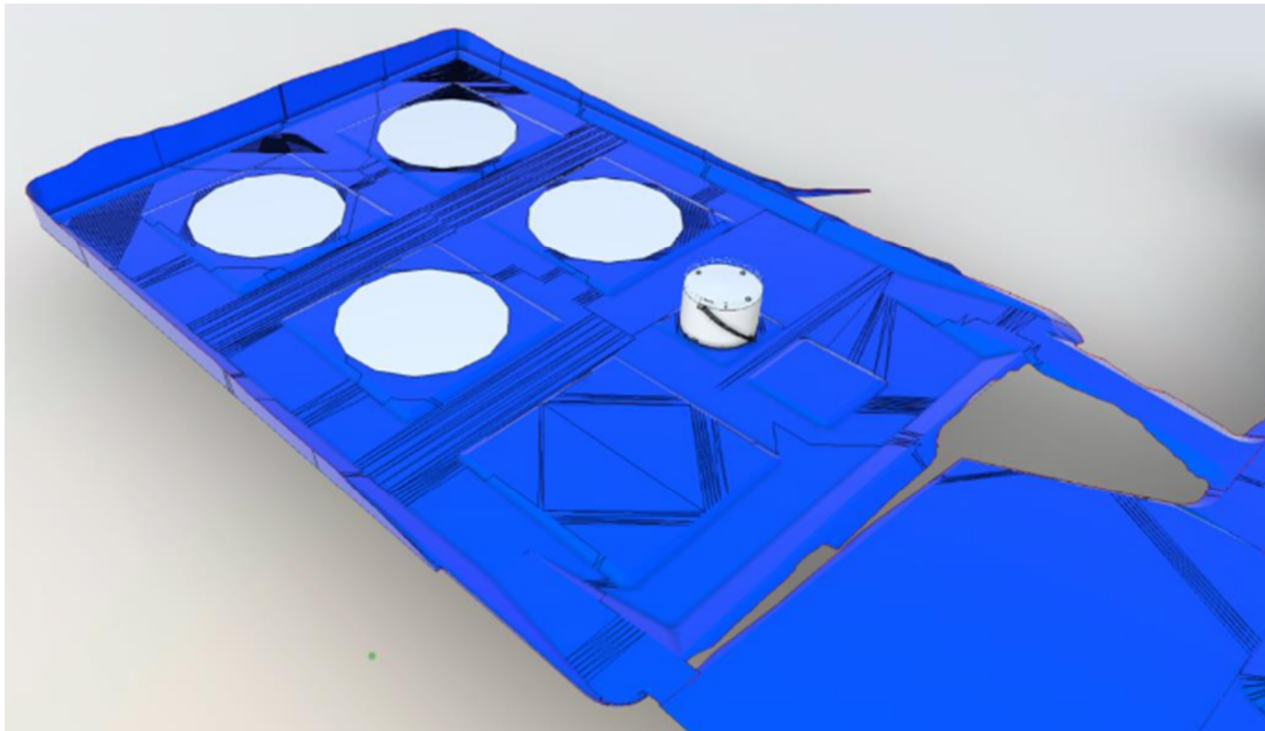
Planned Construction 2026: 1.5 ML Jet-A tank + four 12.5 ML tank floors
